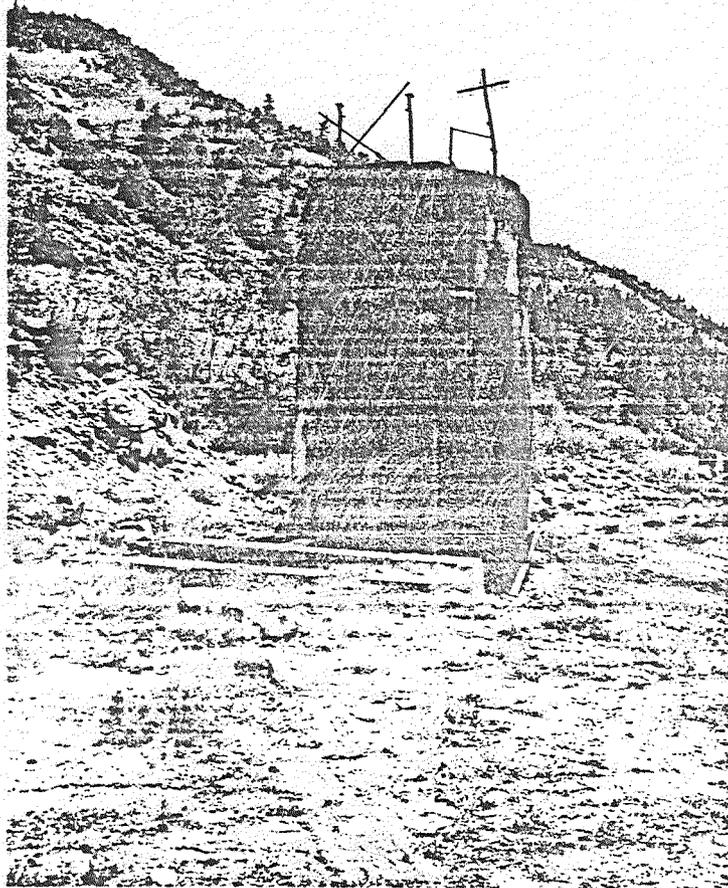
42Cb178. Concrete Footings and Steel Tower.
